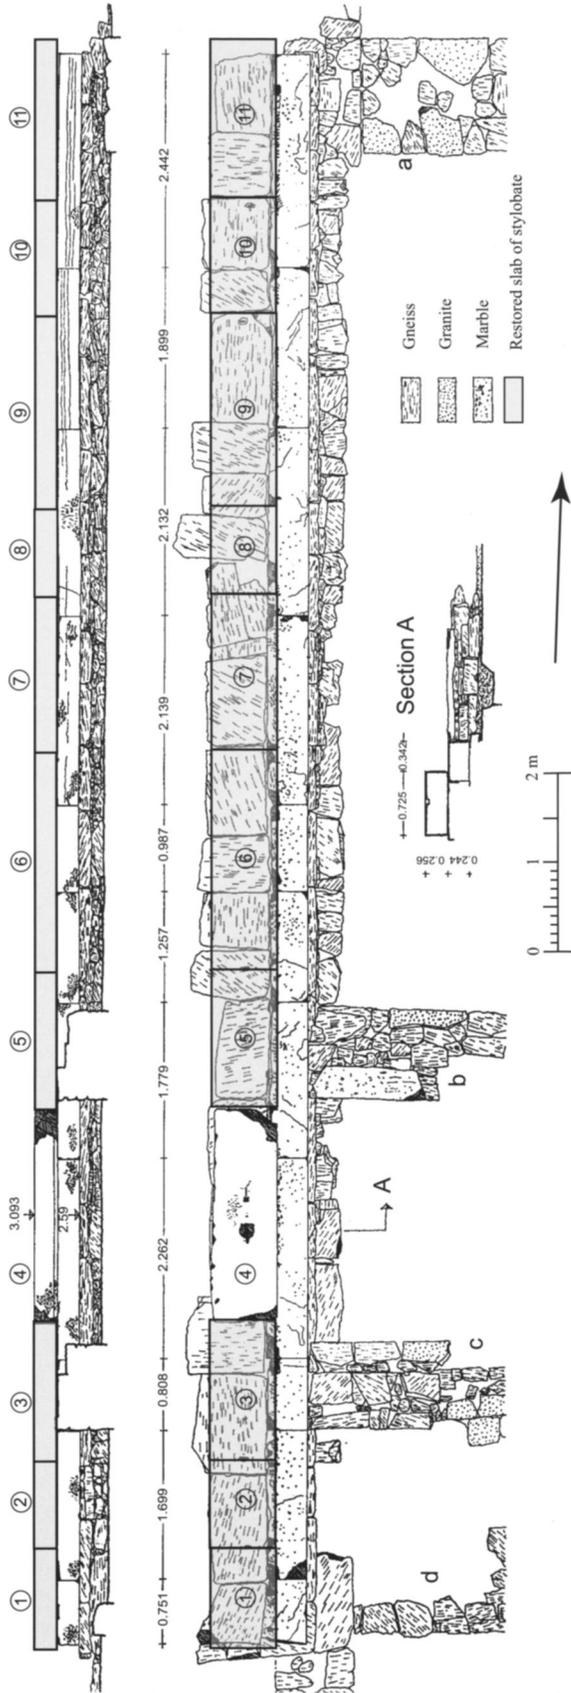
Courtyard C, restoration of the west stylobate slabs; east elevation (*above*) and plan (*below*). After Bruneau 1970, pl. F
